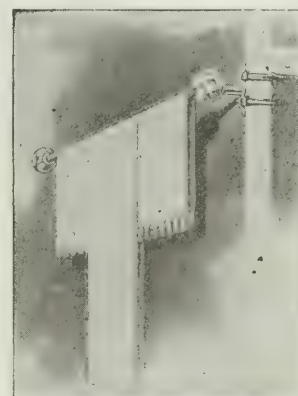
FIG. H. ANKYRAS USED ON BATHROOM FIXTURES
